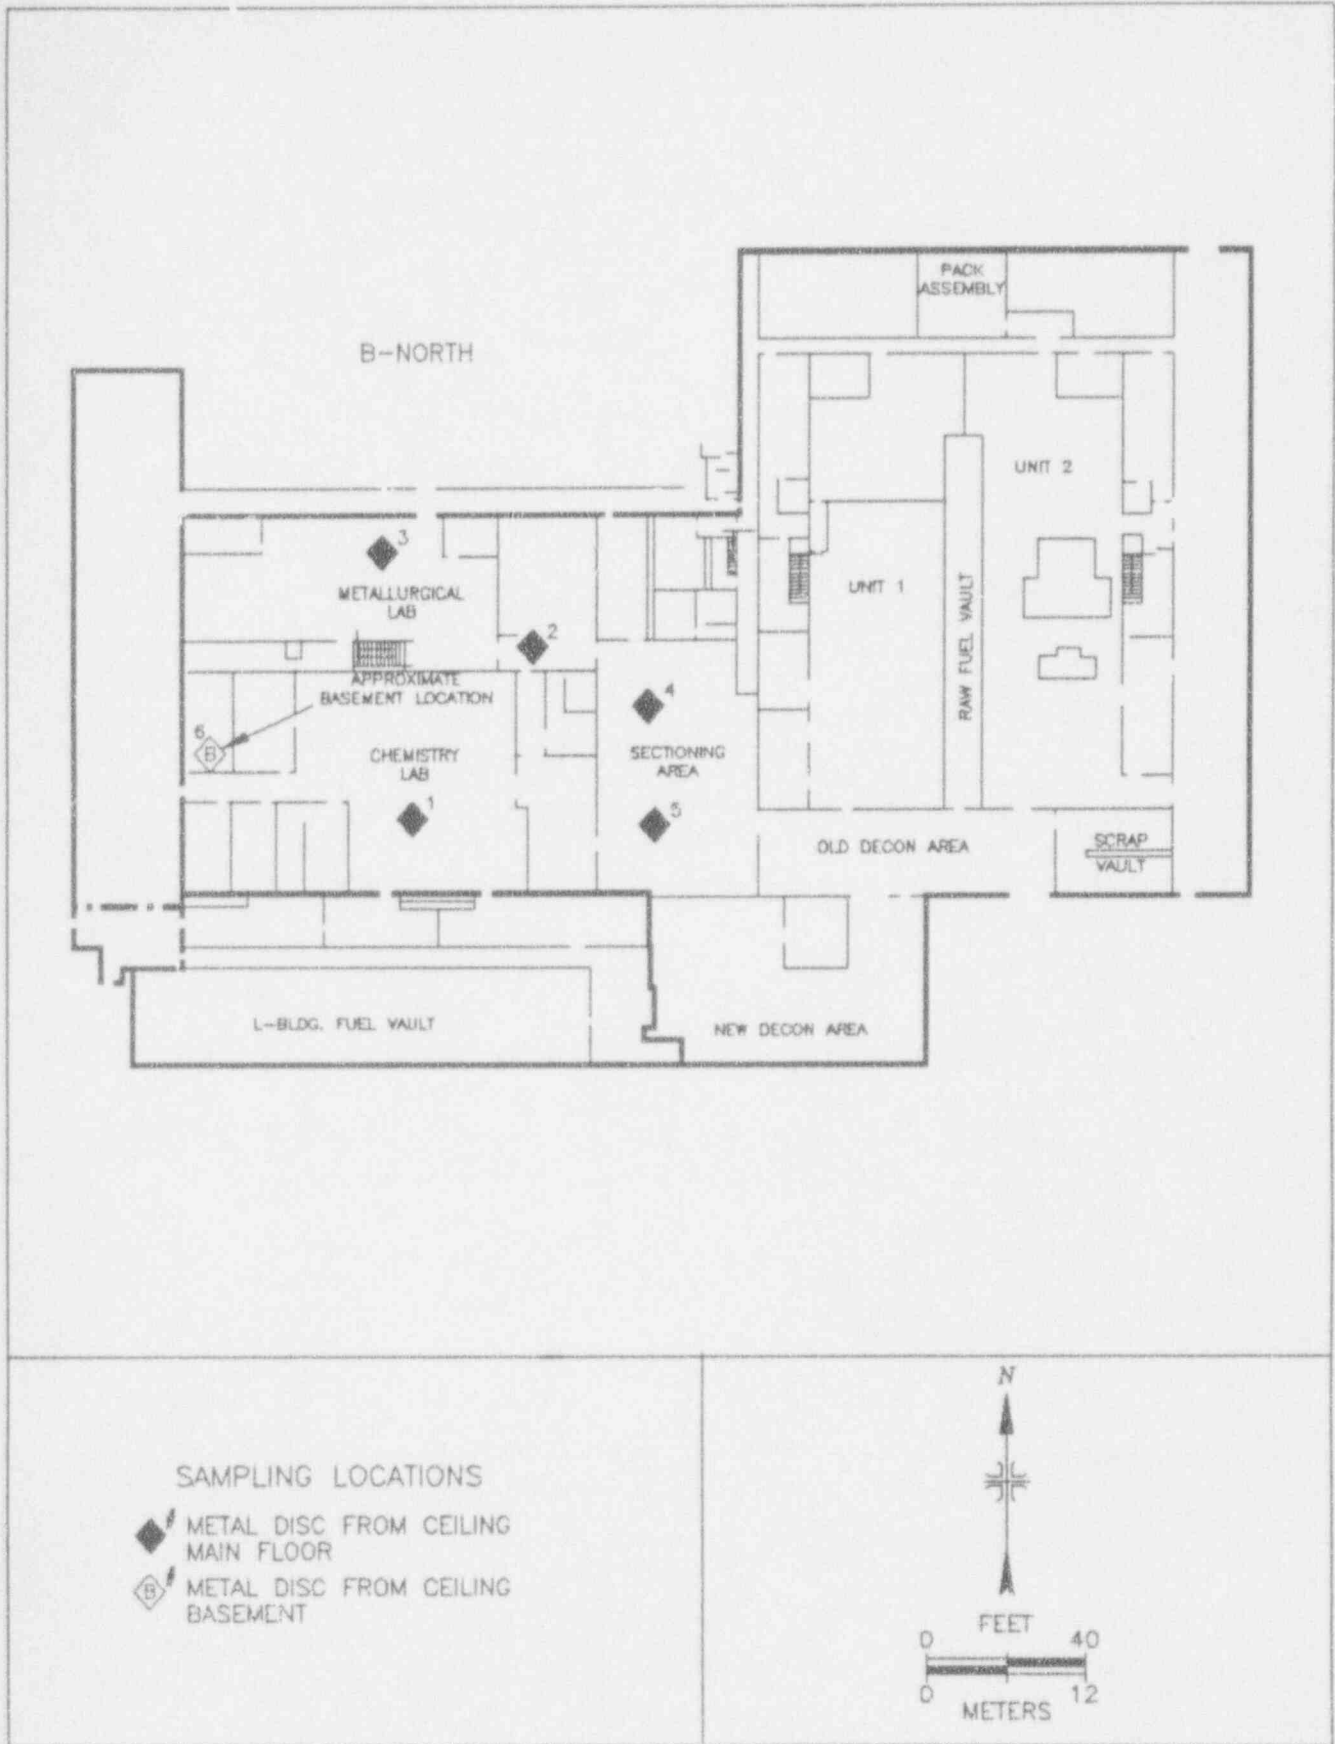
Building B-South - Ceiling Metal Disc Sampling Locations
